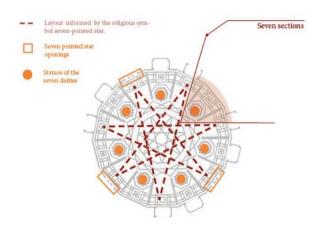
Diagram of architectural floor plan for the Great Sept of Baelor (Author's own image)
